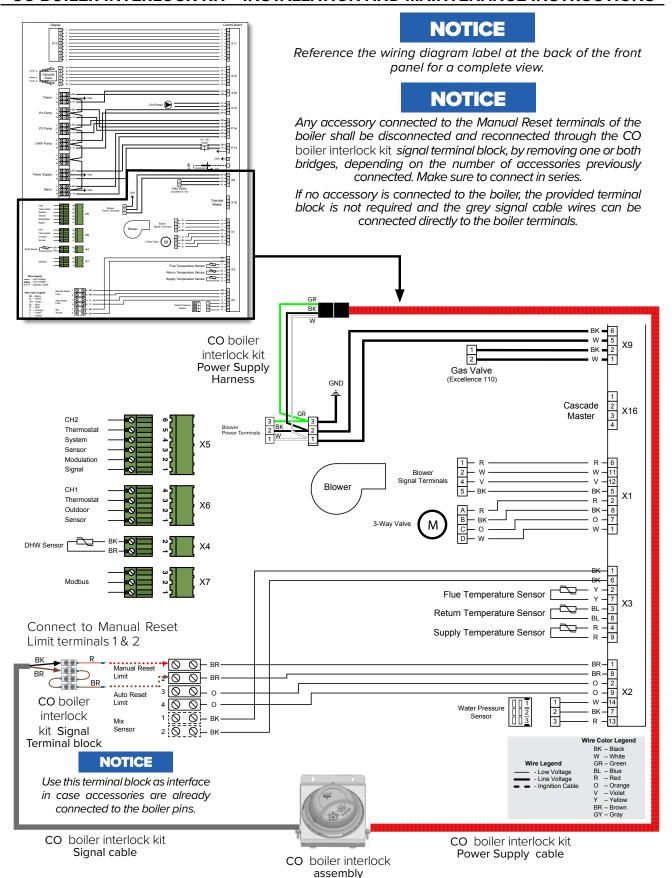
Prestige Excellence PA Boilers - Where to Connect the CO Boiler Interlock Kit
